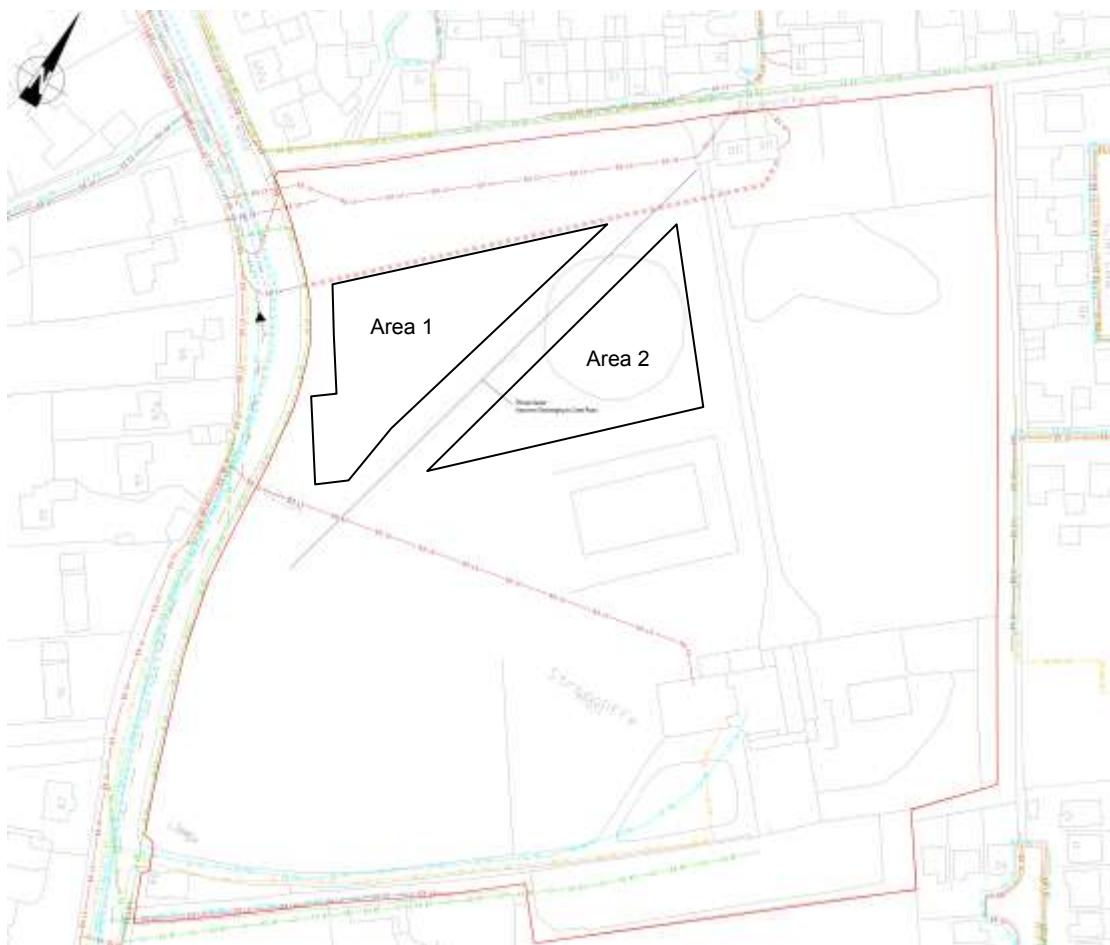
Plan of Strancliffe Hall, showing two areas stripped for excavation,
